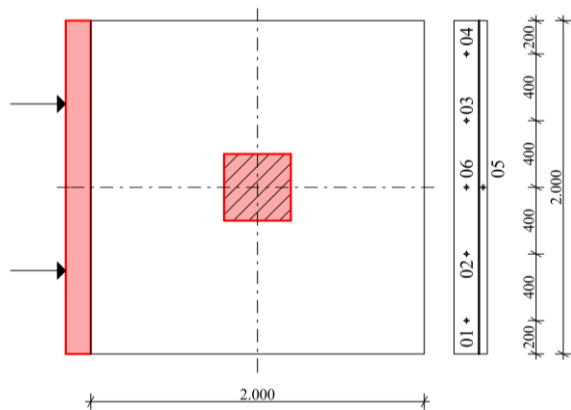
Location of horizontal measuring potentiometers for horizontal loading experiment.
